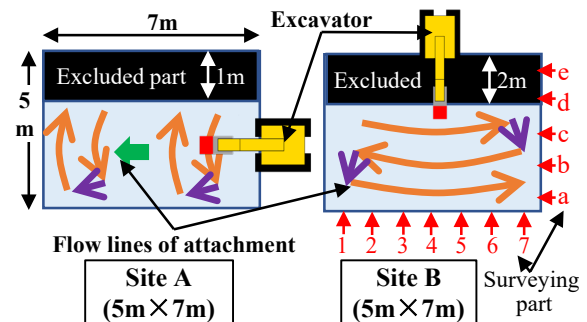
Layout of levelling tests of Site A (left figure) and Site B (right figure)
